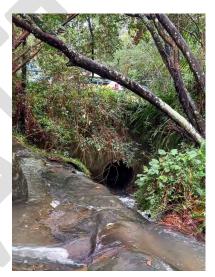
Structure 12, Merilee crescent, Frenchs Forest
